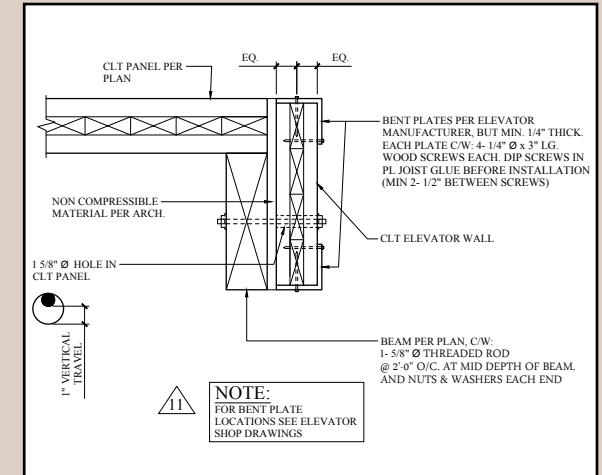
At the CLT elevator shafts, CLT floor panels are supported on a ledge
